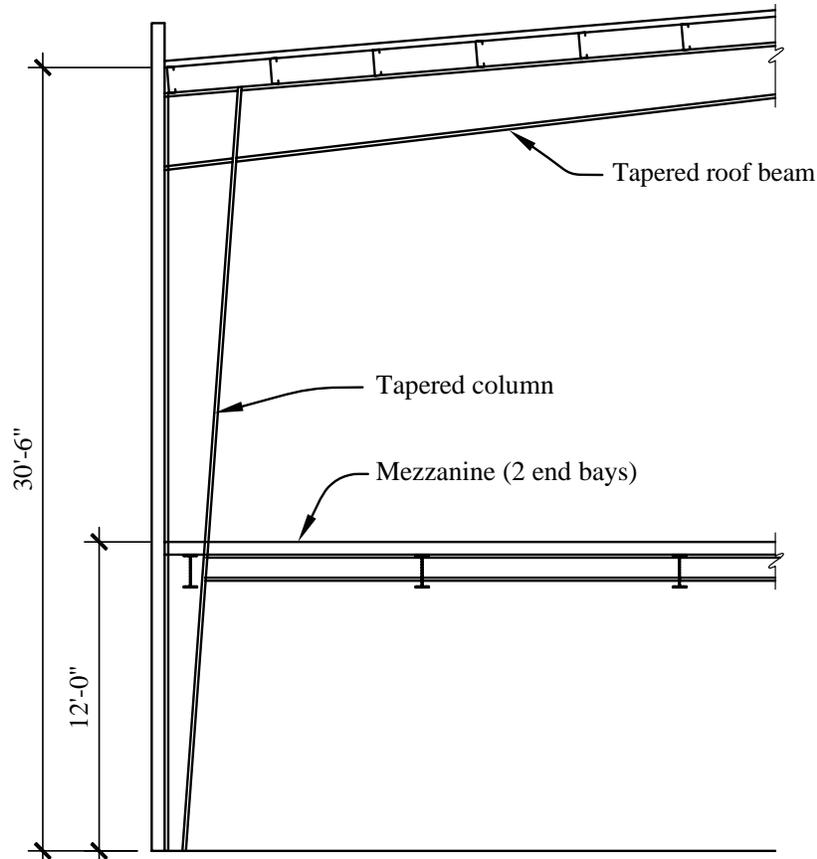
Gable frame schematic: Column tapers from 12 in. at base to 36 in. at knee; roof beam tapers from 36 in. at knee to 18 in. at ridge; plate sizes are given in Figure 5.1-8 (1.0 in. = 25.4+ mm).
